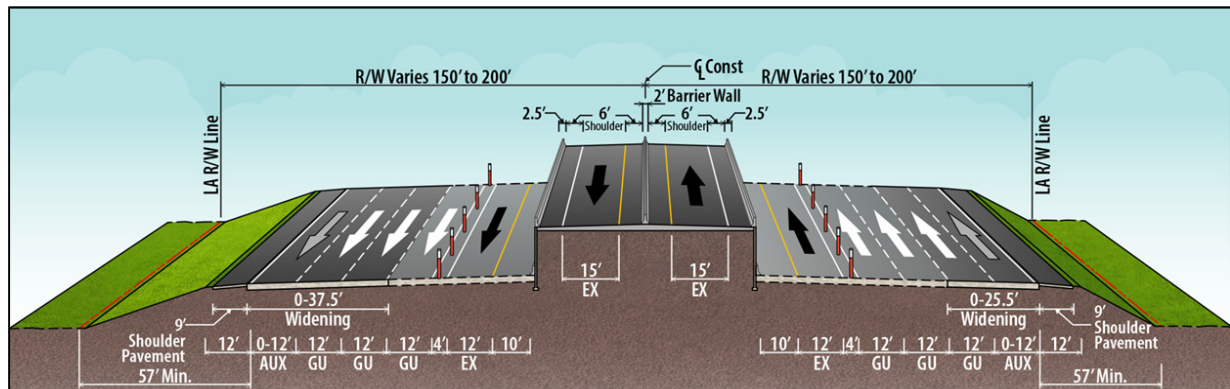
I-275 Mainline Master Plan Build Alternative Typical Section from Roosevelt Boulevard to south of 9th Street North (Segment C-MP2)
